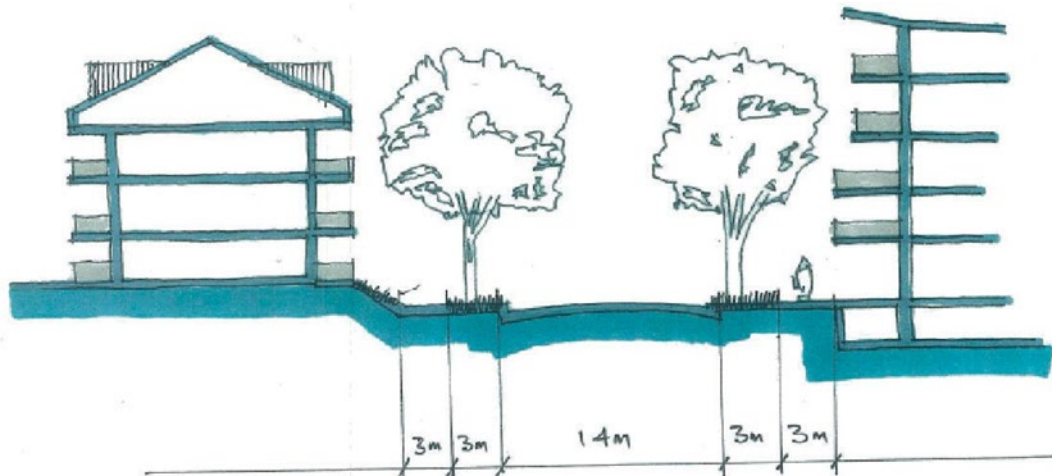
Building Type A and B building as viewed from Broughton Street
